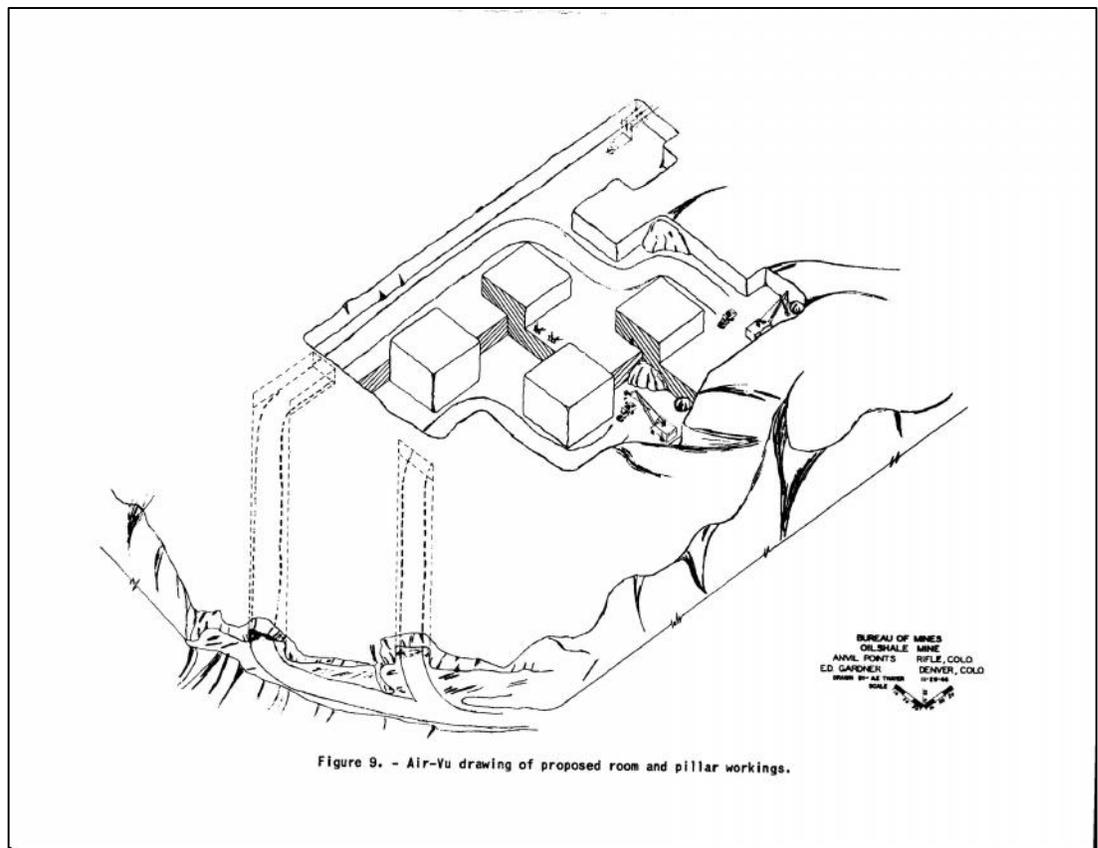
Air-Vu drawing of proposed room and pillar workings.
